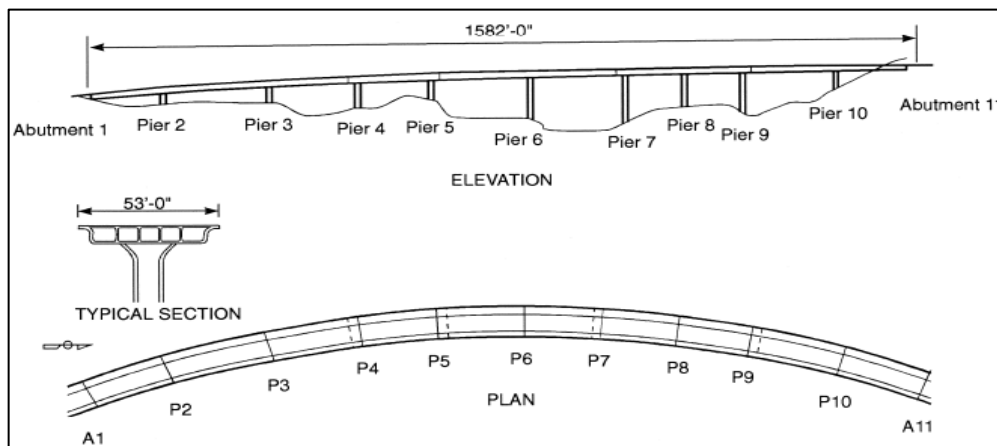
Plan and elevation view of Southbound Separation and Overhead Bridge [5;6]
